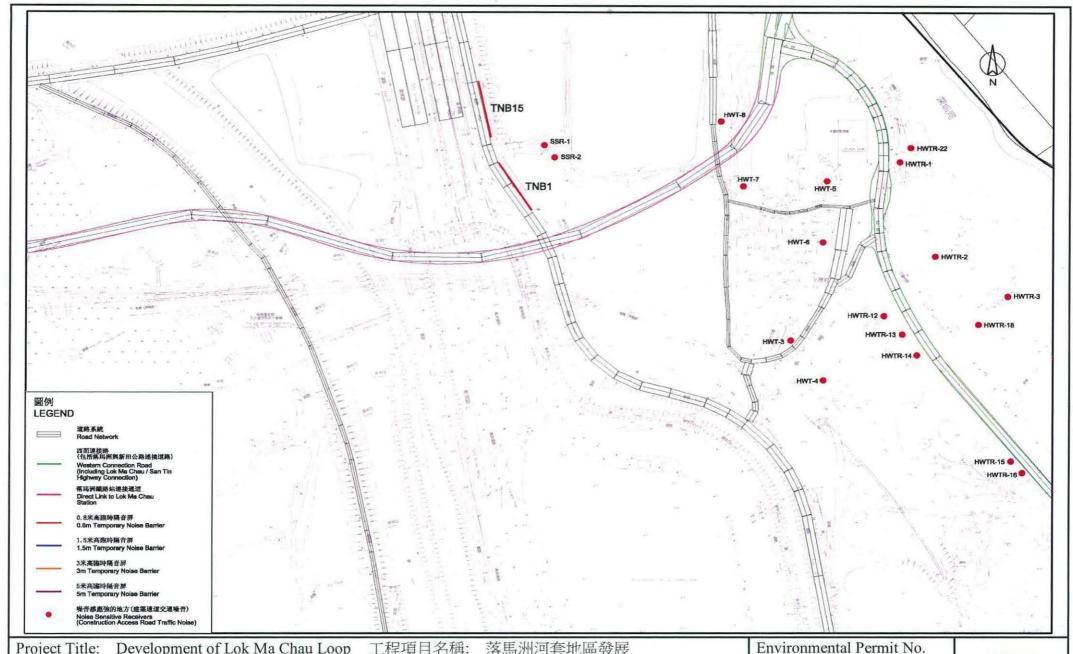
Extents and Locations of Construction Stage Temporary Noise Barriers After the Commencement of Road Widening Works of the Western Connection Road at the Existing Lok Ma Chau Road (Sheet 1 of 2)
